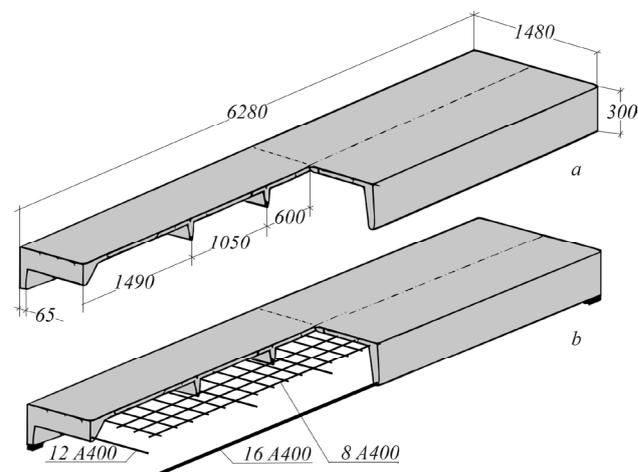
The investigated reinforced concrete ribbed slab: a – general view; b – structural diagram
